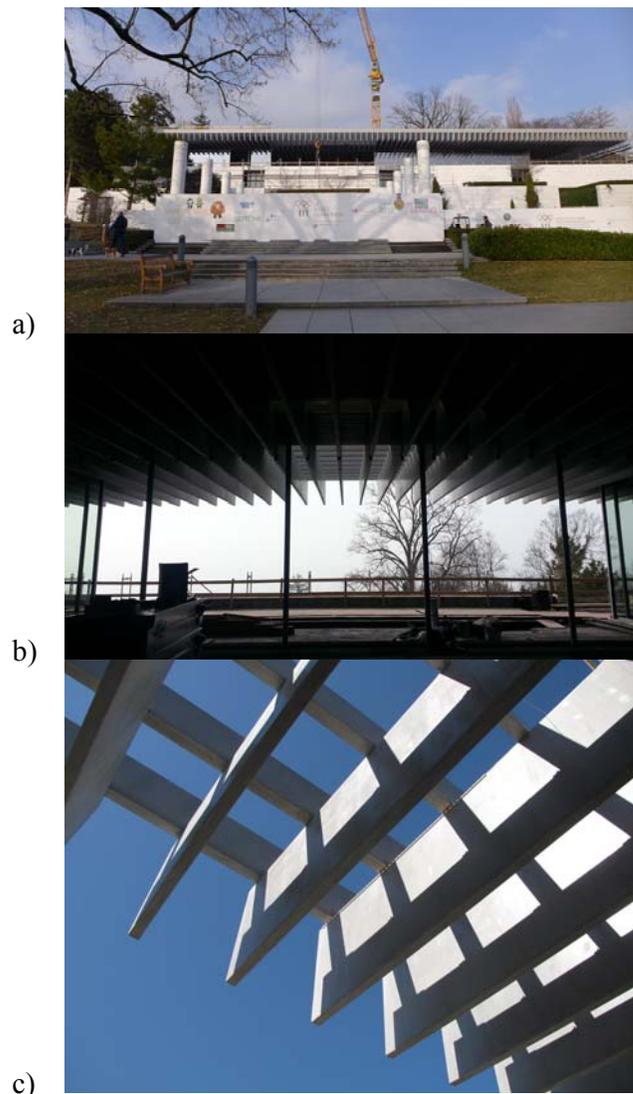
a) South facade of the Olympic Museum and new roof during construction, b) view towards the lake, and c) view of the canopy
